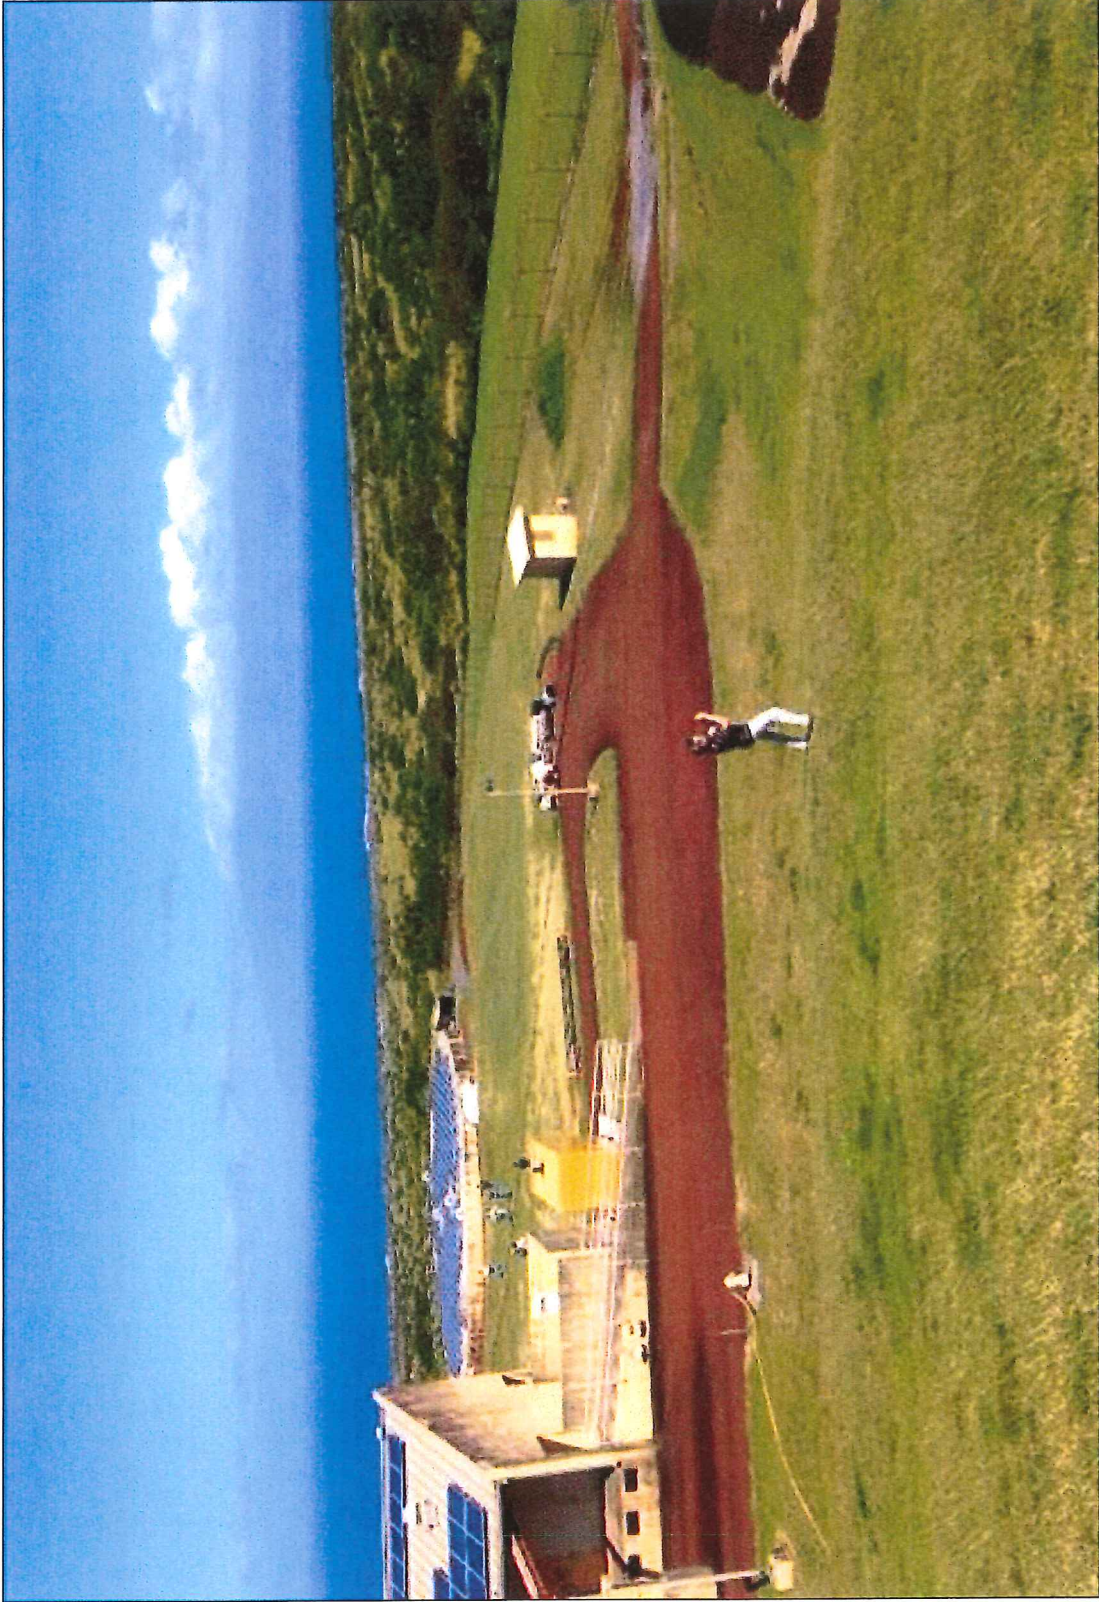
Photograph of Existing Water Treatment Facility. Current Project Area is to Left of Chain-Link Fence, in Grassy Field toward Top of Frame. View to Southwest.
